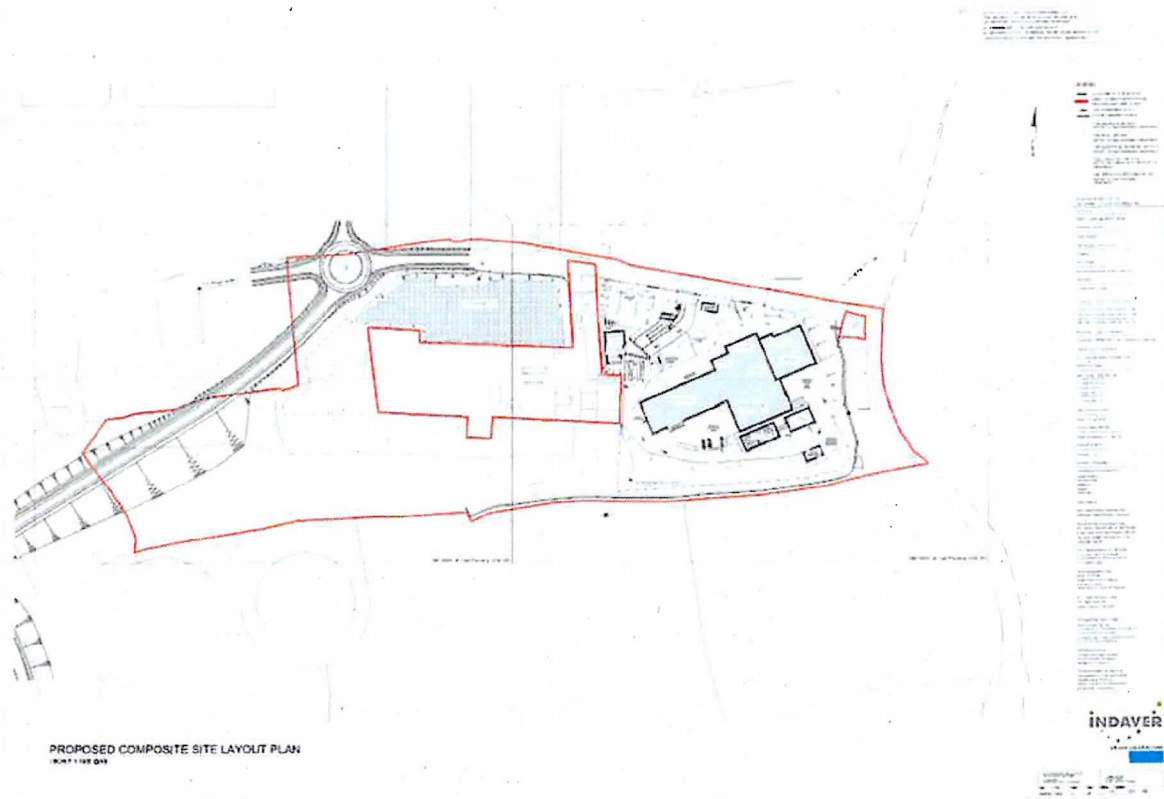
Proposed Composite Site Plan with Ringaskiddy Relief Road within planning boundary.
